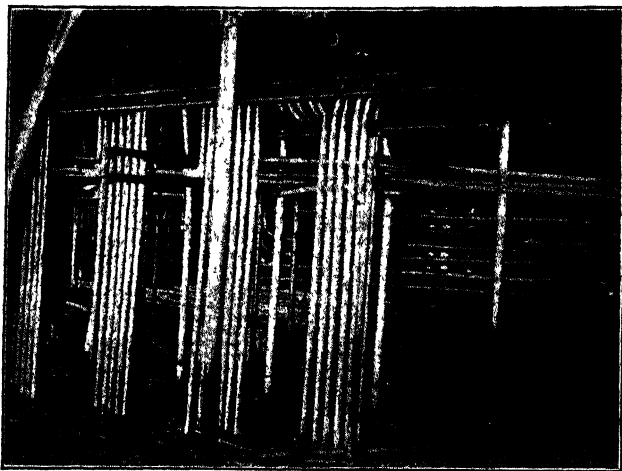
Essex station, Public Service Corporation of New Jersey. Control conduit room. All conduits for the entire switchhouse building terminate in this room.
